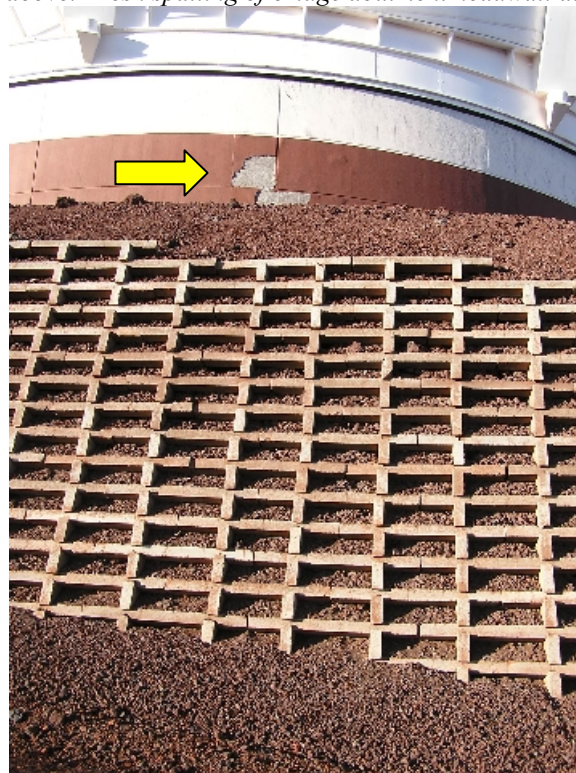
Location 28, Keck Observatory, Mauna Kea summit. No apparent distress to high embankment beside the observatory. Spalled stucco evident at two places on the exterior wall of the building (one arrowed).
